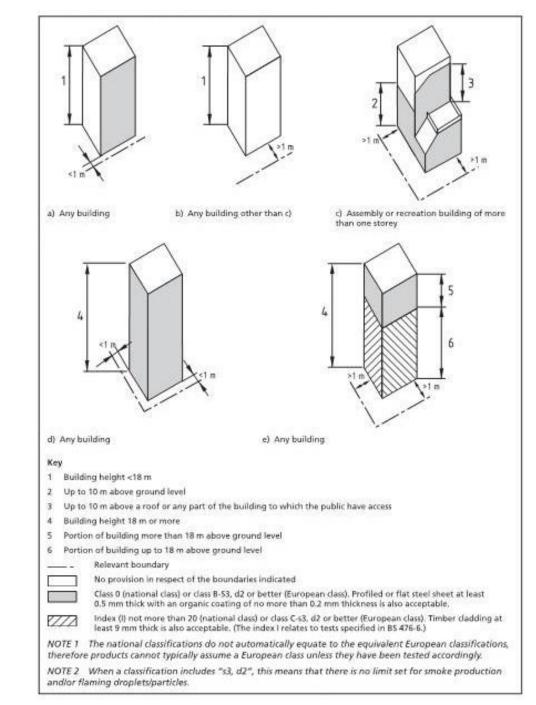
Figure 45 of BS 9999 - Provisions for external surfaces of walls
